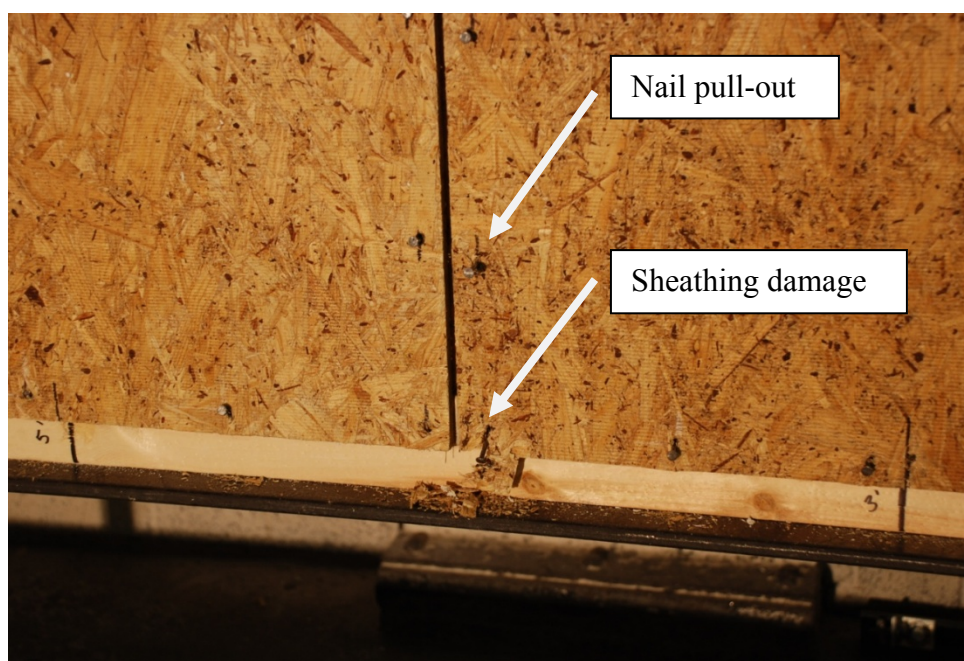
Damage to inner corner of sheathing along base plate of Specimen A1-1C
